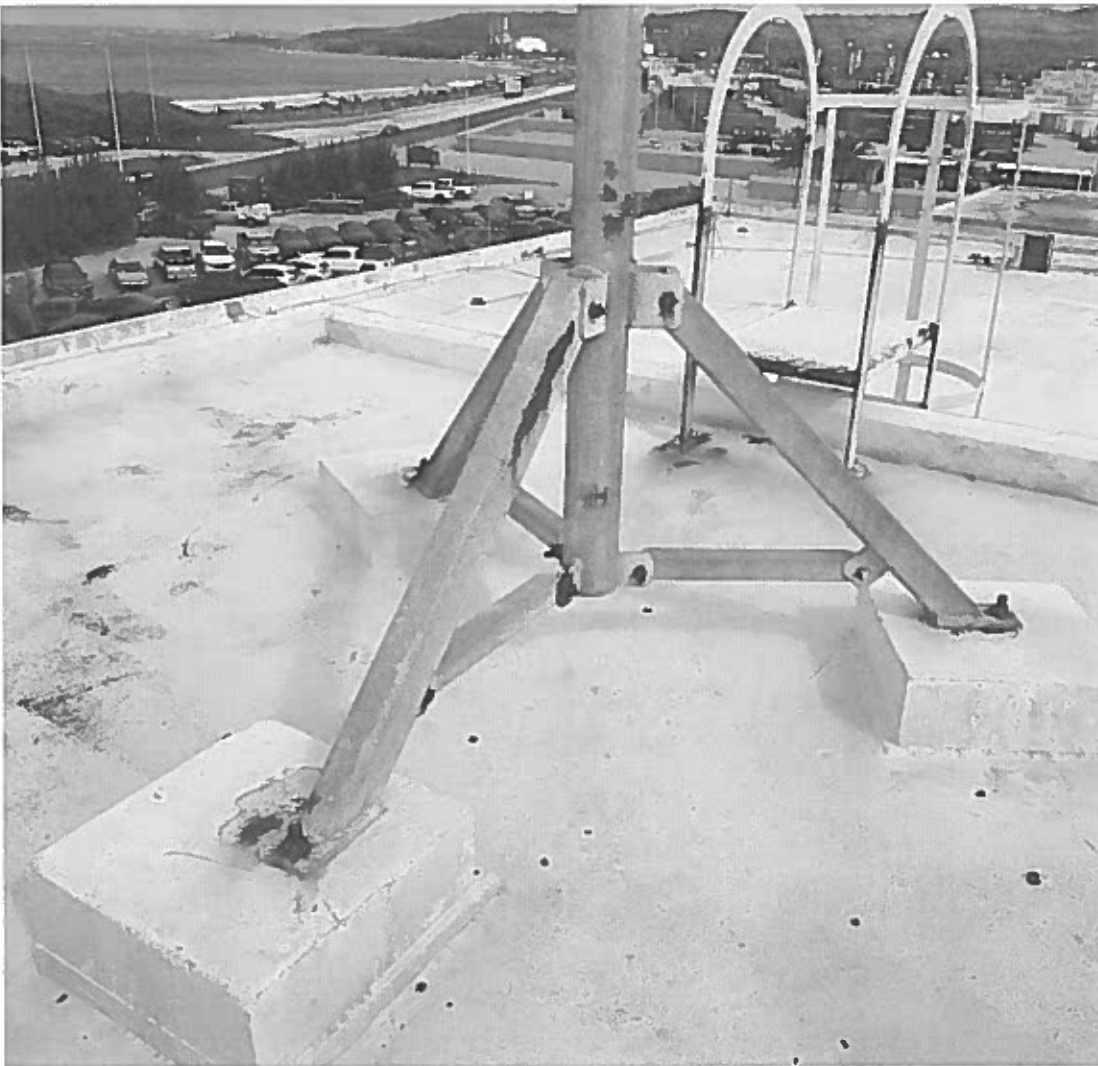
Galvanized Steel Tripod and Concrete Support Blocks (Close-up). Location: Admin. Bldg. 3rd Floor
